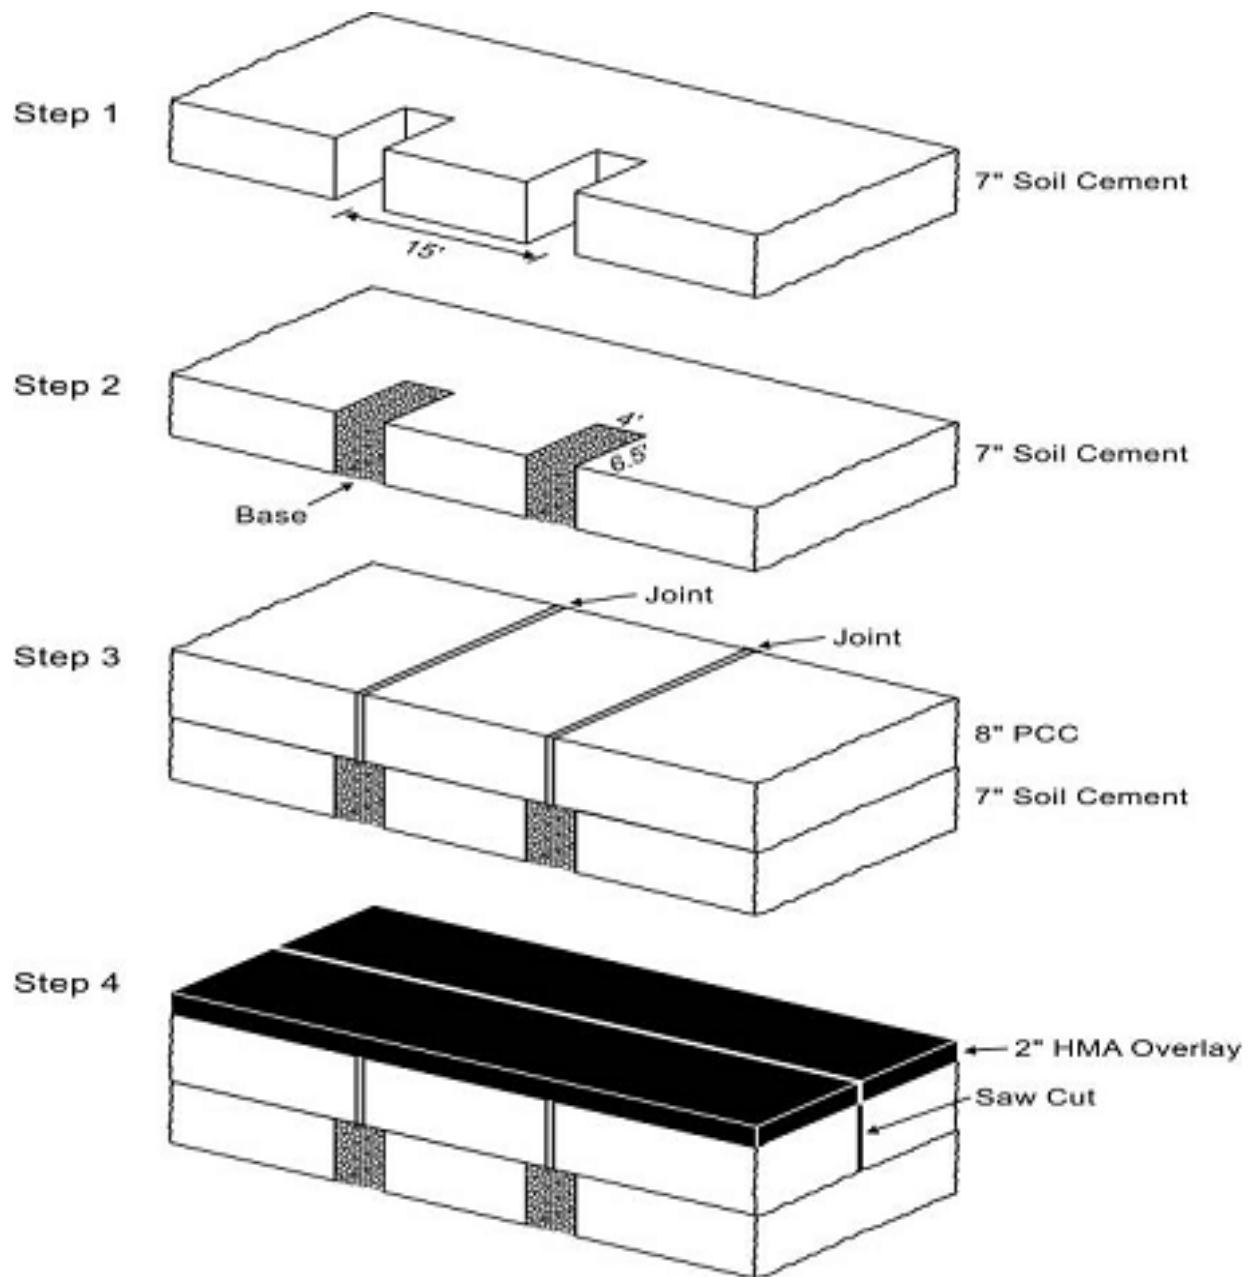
Construction of the Low LTE Joints at the LTRC-APT Test Site (TTI Lane 1).
